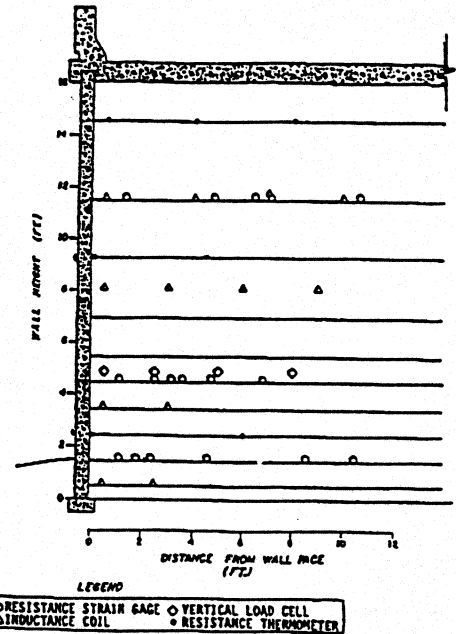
SCHEMATIC OF INSTRUMENTED EARTH REINFORCED RETAINING WALL (WALL 26-32)
